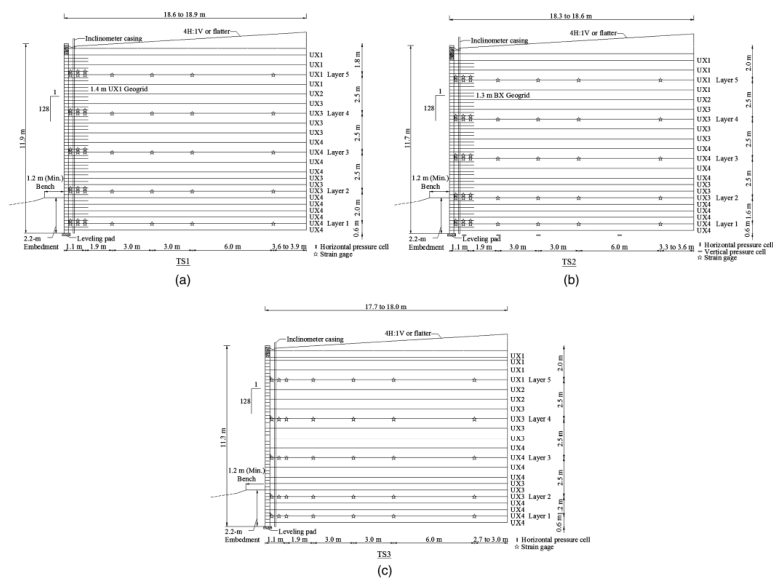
Cross sections of the three test wall sections with instrumentation (not to scale): (a) TS1; (b) TS2; (c) TS3
